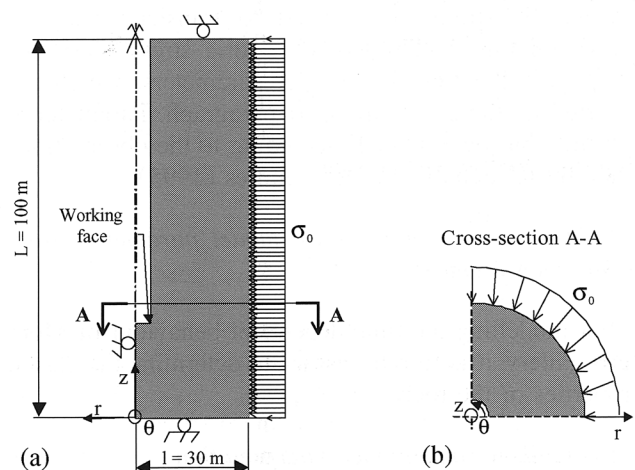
Geometry of the model mesh: (a) longitudinal section, (b) typical cross-section.
